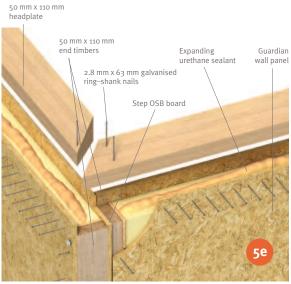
Install Mitred Headplates – cut angle to suit roof pitch
